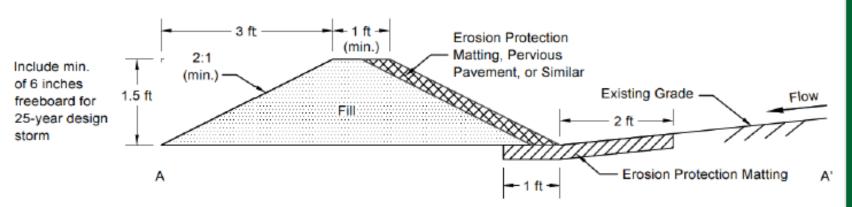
Proposed Diversion Berm Concept Design Cross-Section A - A'
